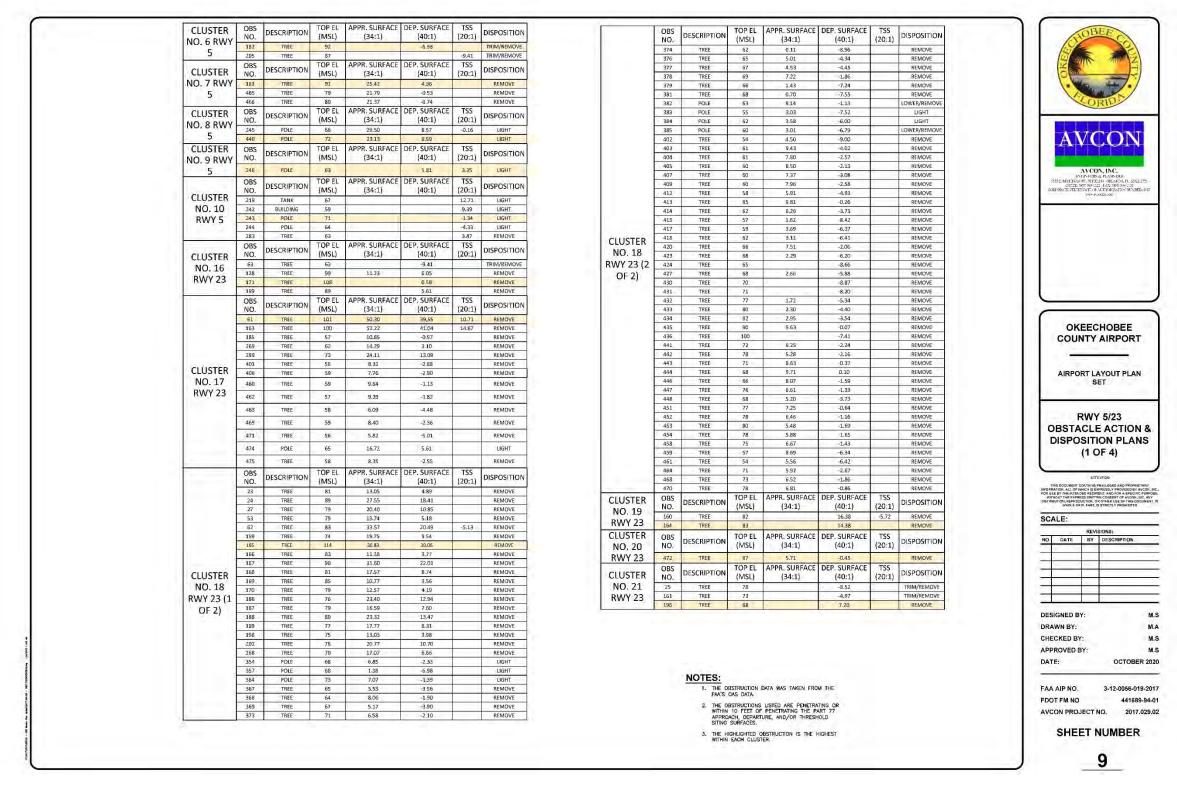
RUNWAY 5/23 OBSTACLE ACTION AND DISPOSITION PLAN
